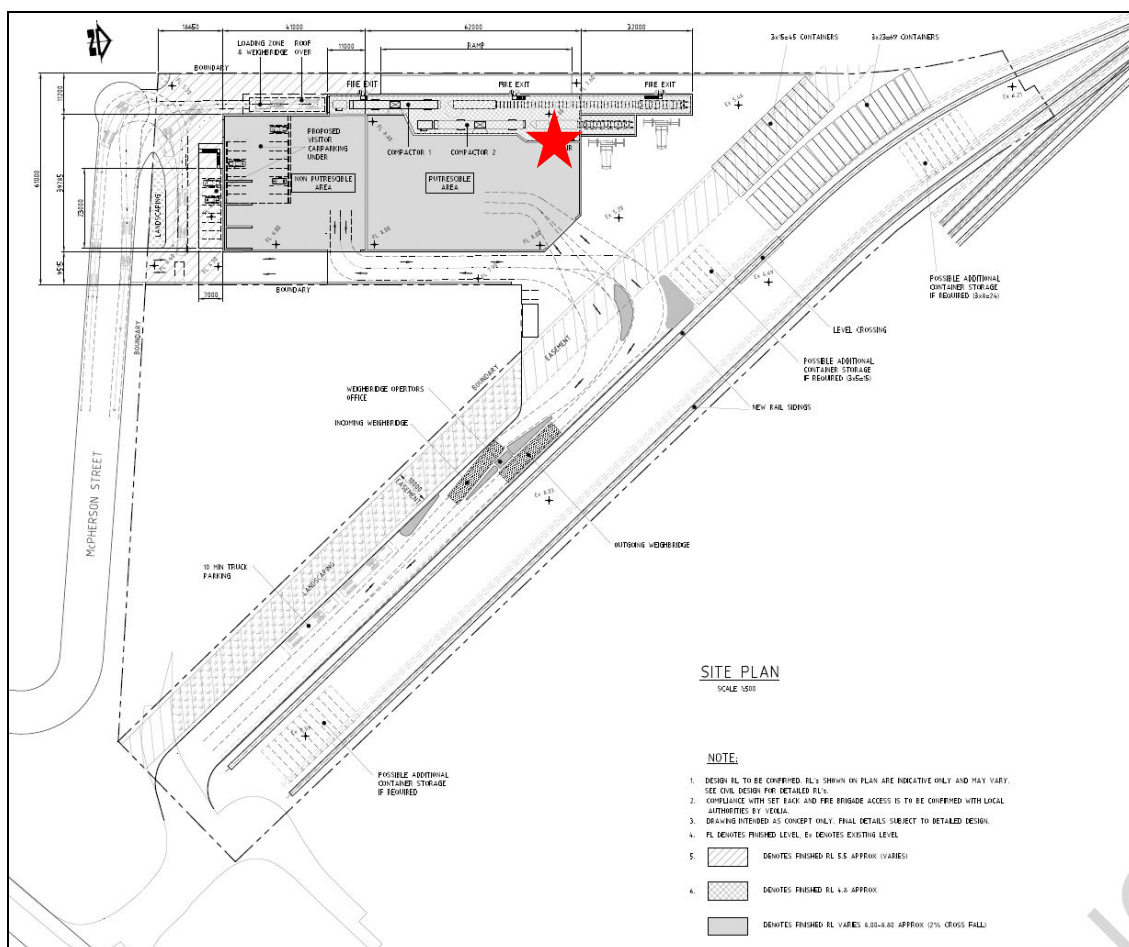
Site layout and approximate building ventilation stack location (image Hyder Consulting Drawing No. A001-B).
